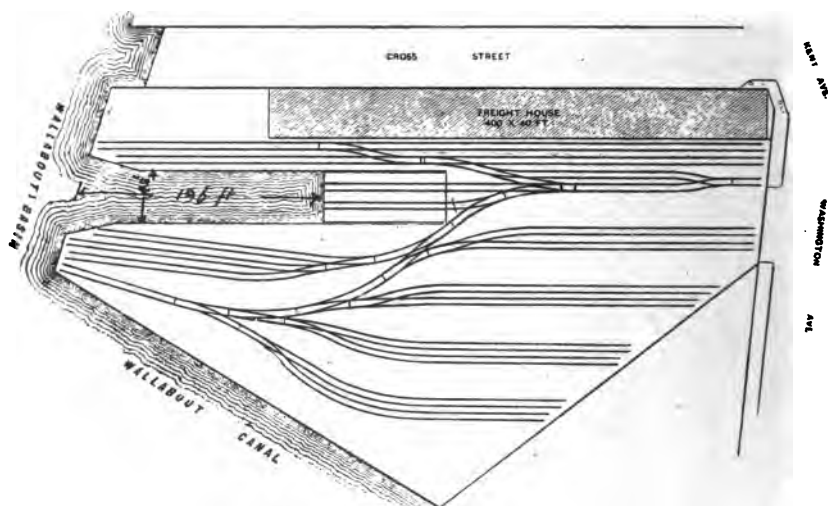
Plan of Wallabout Yard, Brooklyn, N. Y.
